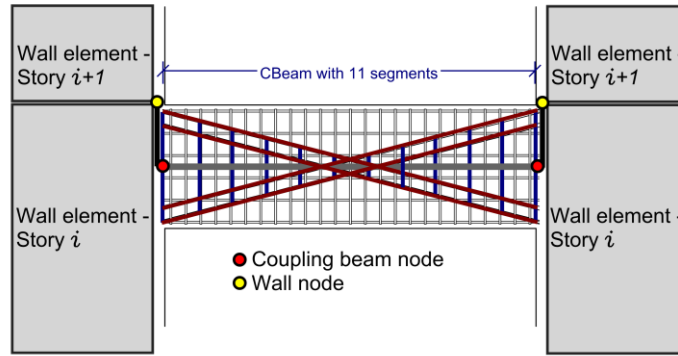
Coupling beam discretization and its connection to adjacent walls.
